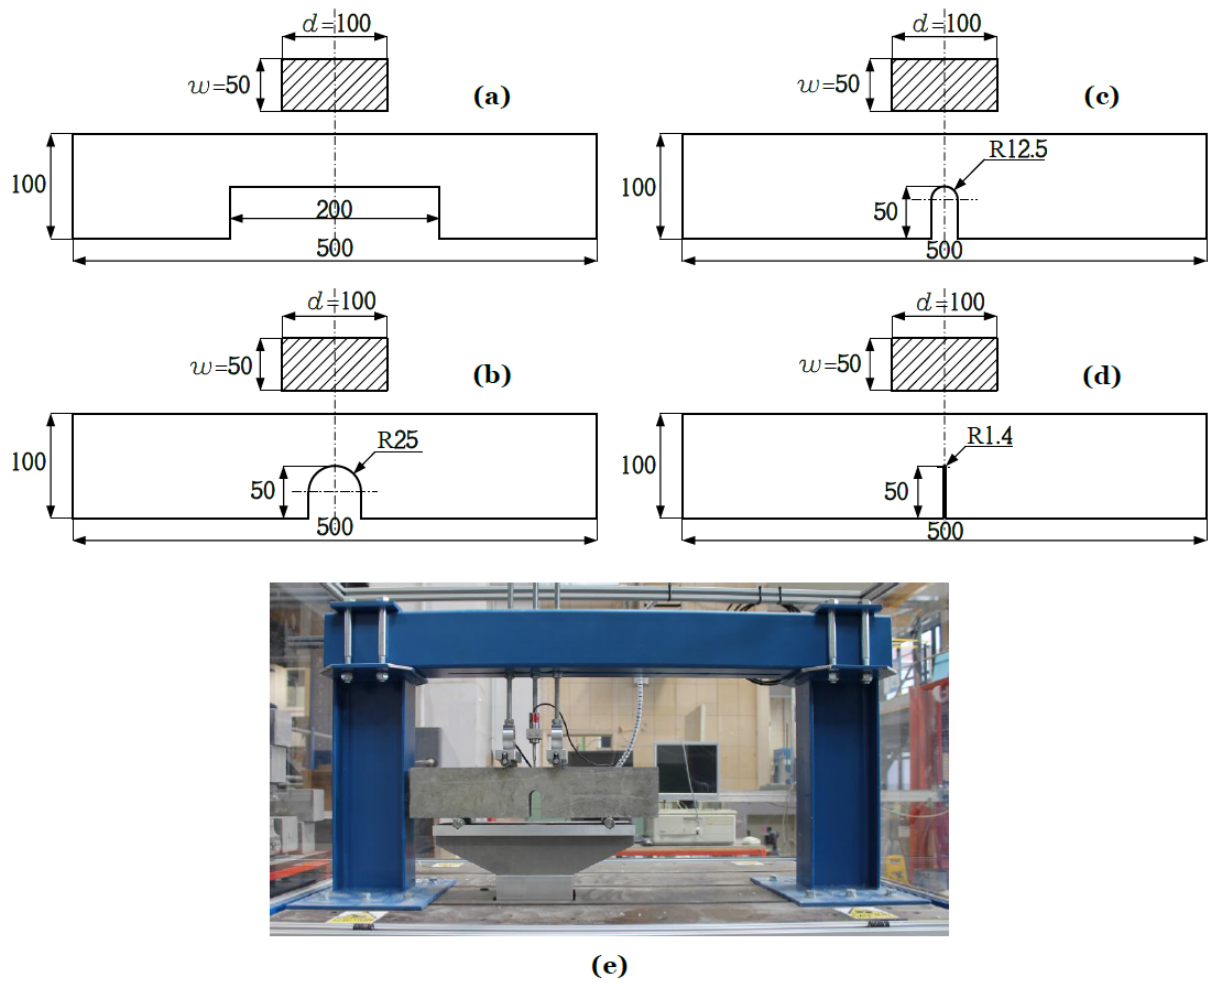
Geometry of the investigated specimens (dimensions in millimetres) and fatigue testing apparatus.
